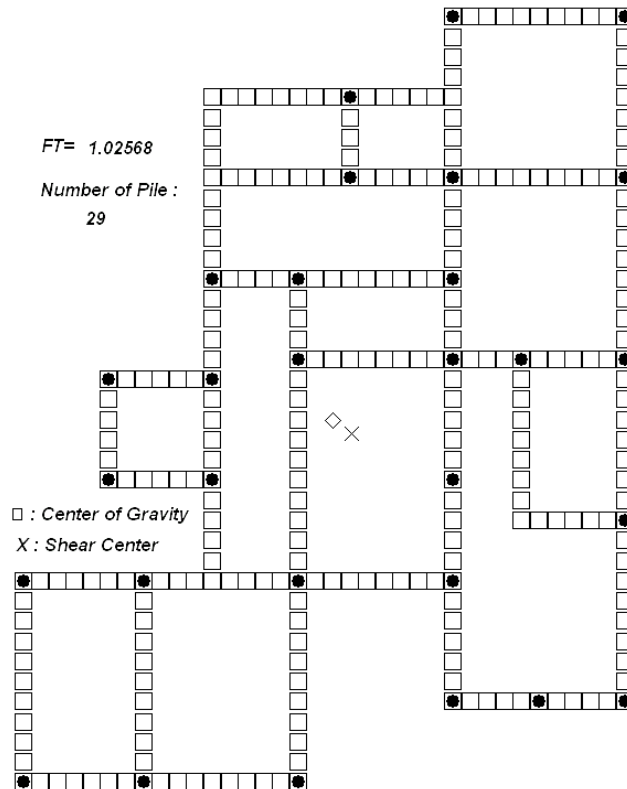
Result of pile placing on continuous footing layout using GA at 500 generation.
